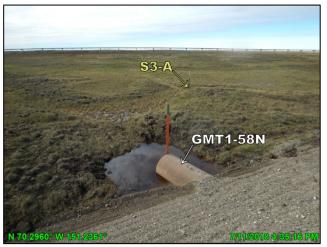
S3 gages and culverts, looking north; July 11, 2018
